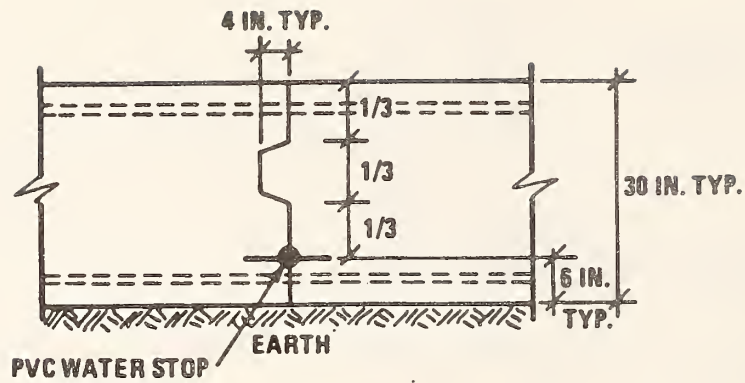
Repair of Wall Defects - Expansion Joints
